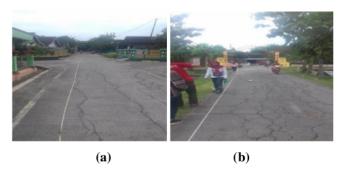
Vertical Cracking (a) and Crocodile Skin Cracking (b)
